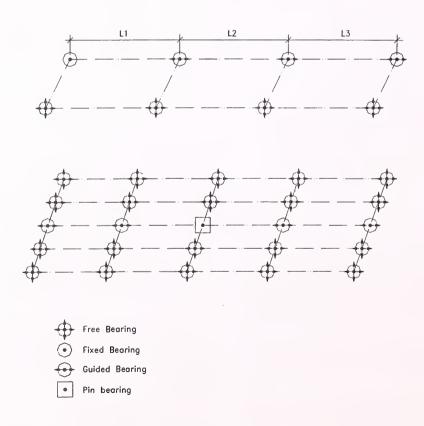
Typical Bearing Layouts for Skewed Continuous Bridges
